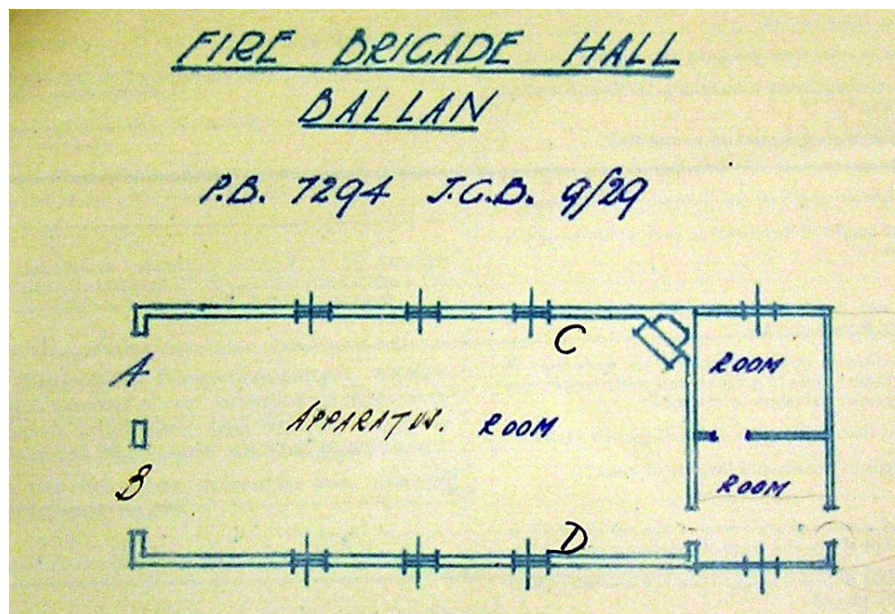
Country Fire Brigades' Board, Floor Plan of the Ballan Fire Station, 1929.
